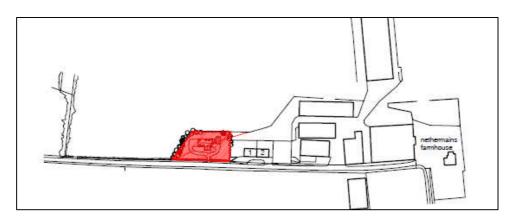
Site plan illustrating the relationship of the proposed dwellinghouse with the existing farm buildings and residential properties
